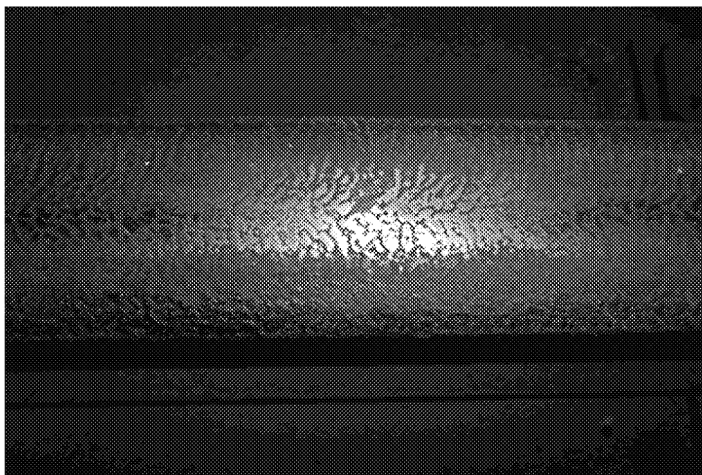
Rail Head Contamination in Main Tunnel (Image 1)
